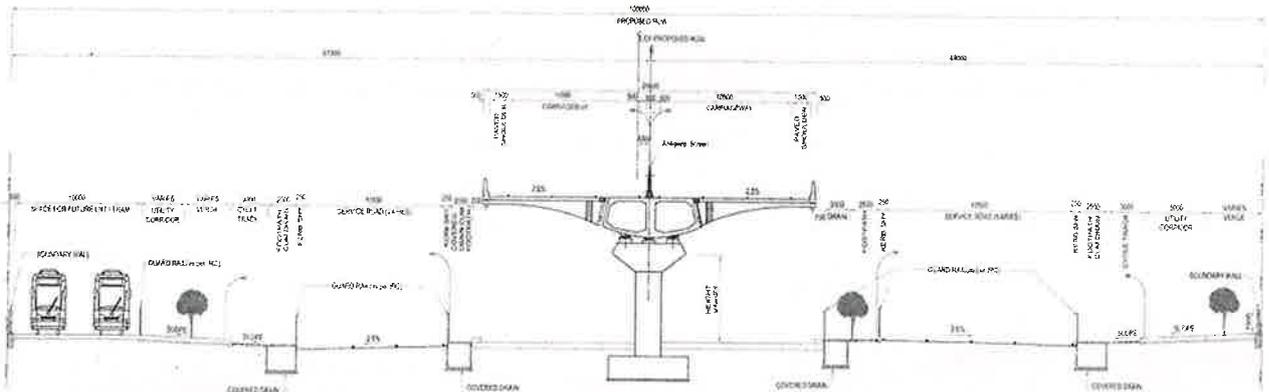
Typical Arrangement of UER 2 at Karala-Kanjhawala Road Junction (Chainage 14+000)
